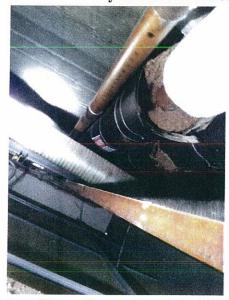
Perimeter hot-cool loop above suspended ceilings – note asbestos labels
